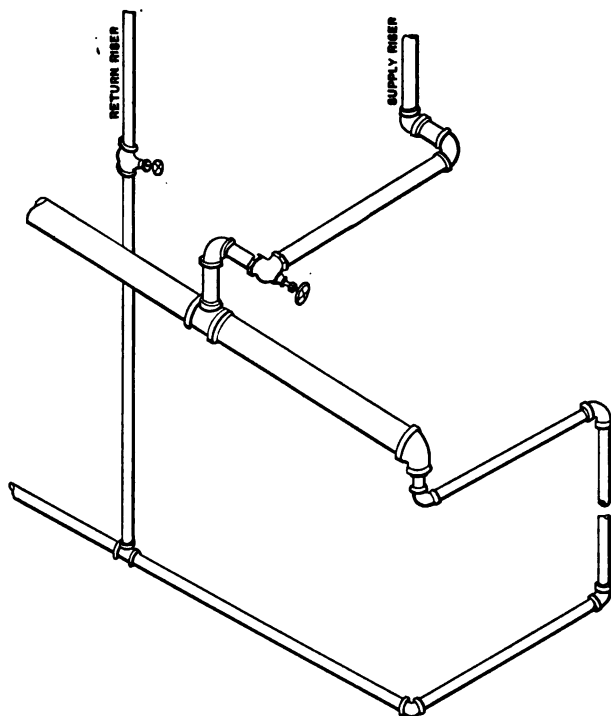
Basement Piping Riser Connections and Expansion Loop
